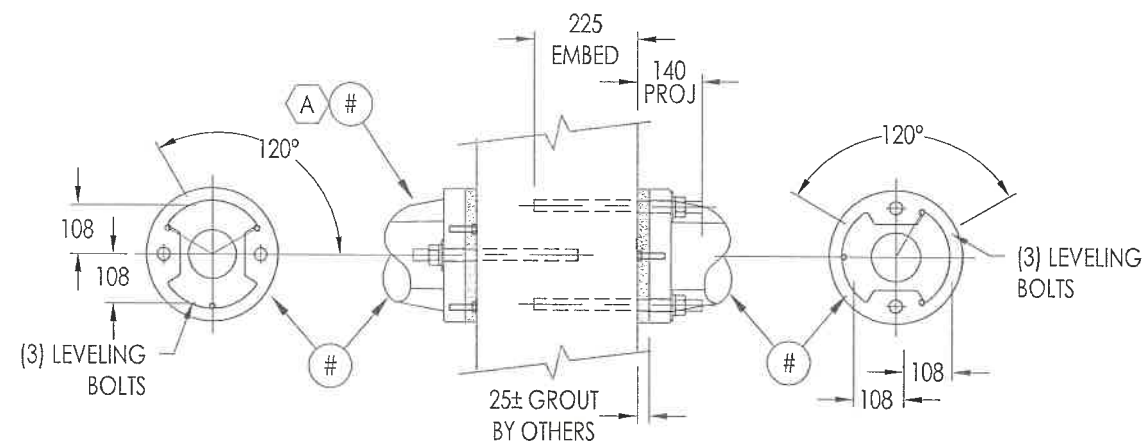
HEAD SHAFT BULL END SPINDLE(S)
